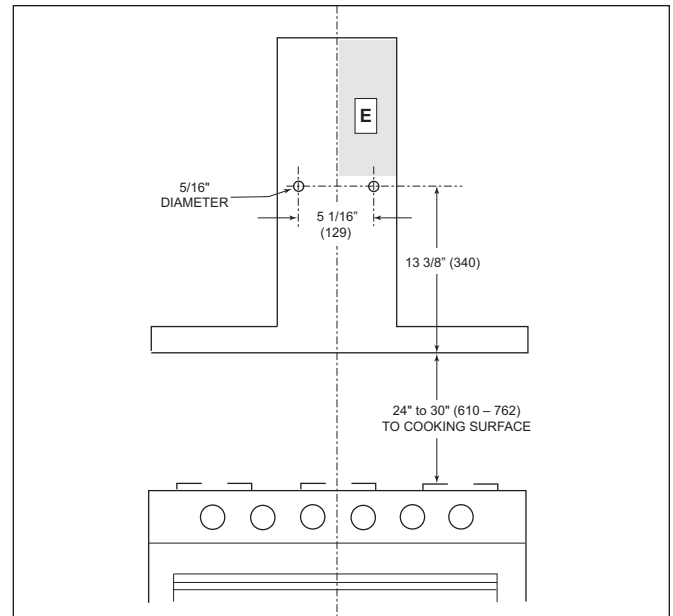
CTE Wall Hood Mounting Plate Placement
